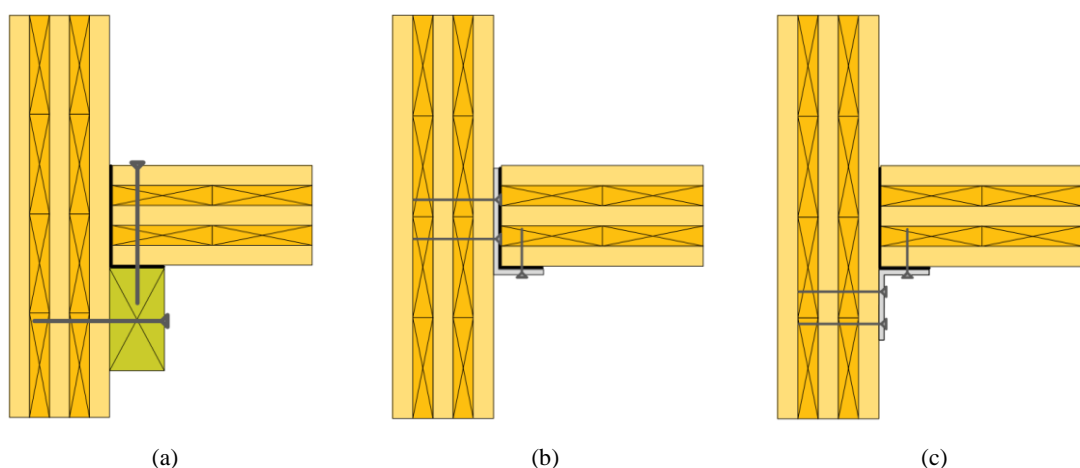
Examples of wall-to-diaphragm connections on balloon type buildings: wood ledgers (a), metal brackets (b,c) [32].
